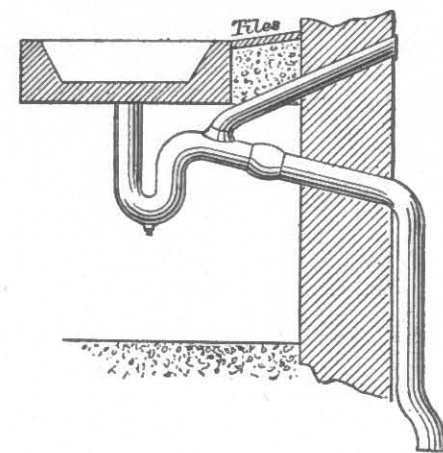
Waste-pipe and Air-pipe to Sink.
